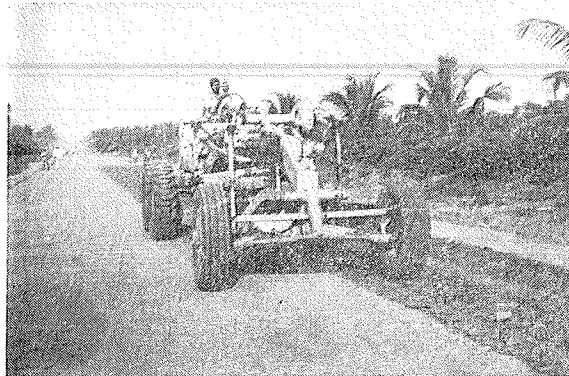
Excavation of Soil with a grader, for in-situ Cement Stabilization.
